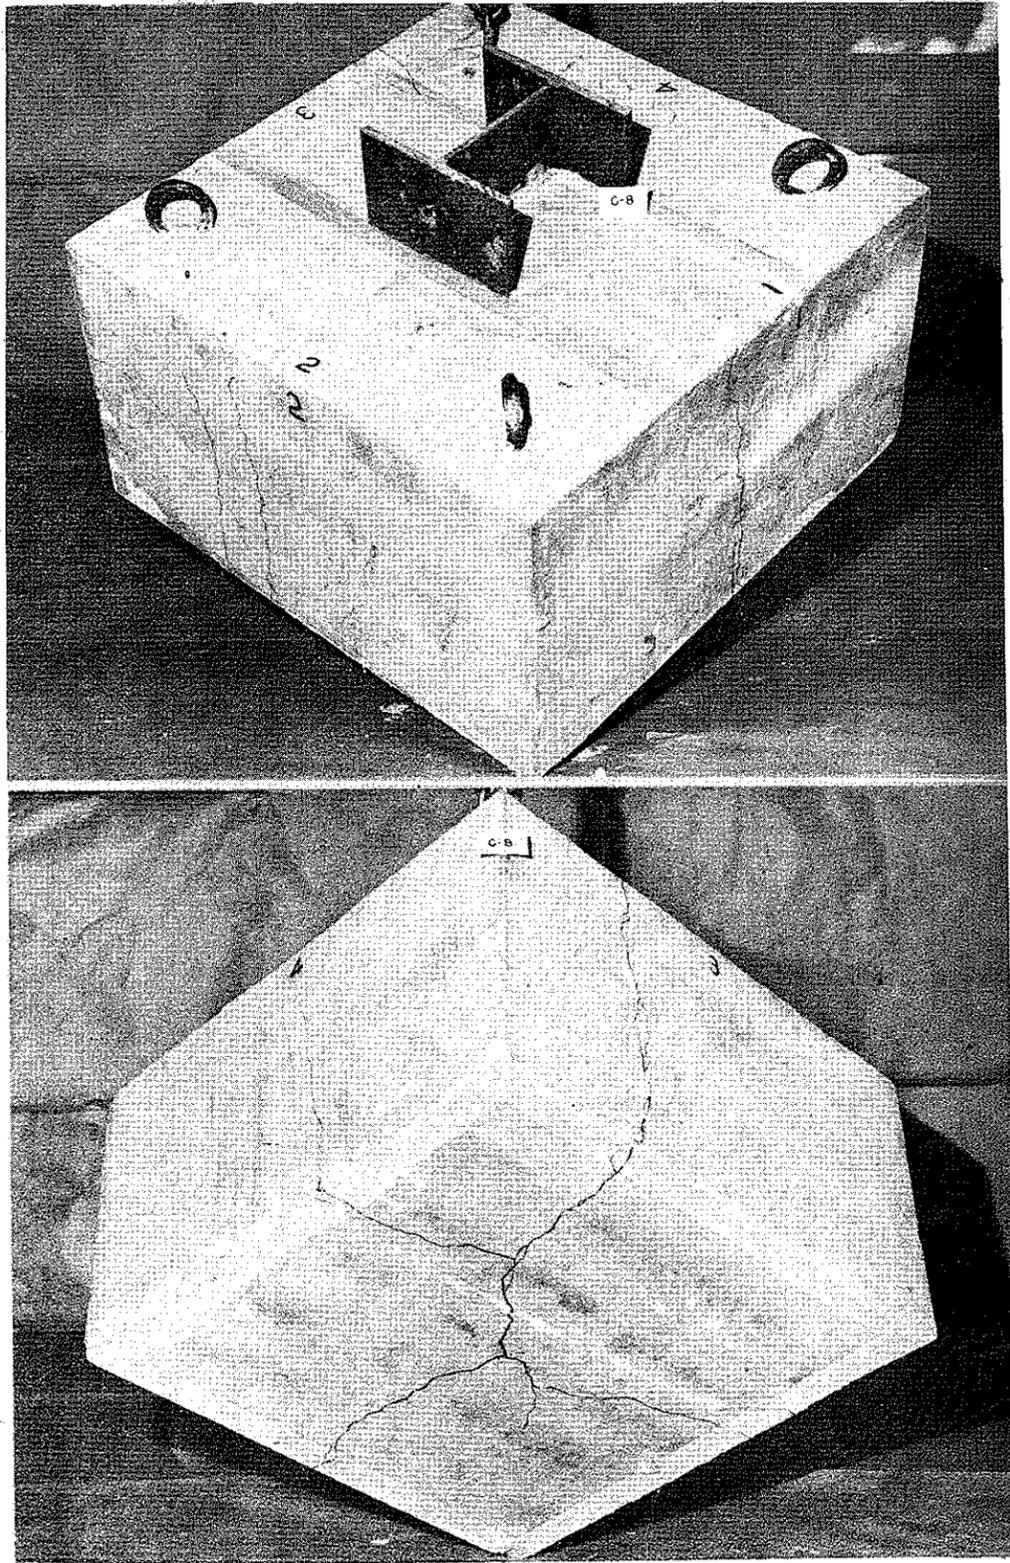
APPEARANCE OF SPECIMEN C-8 AFTER TESTING.
